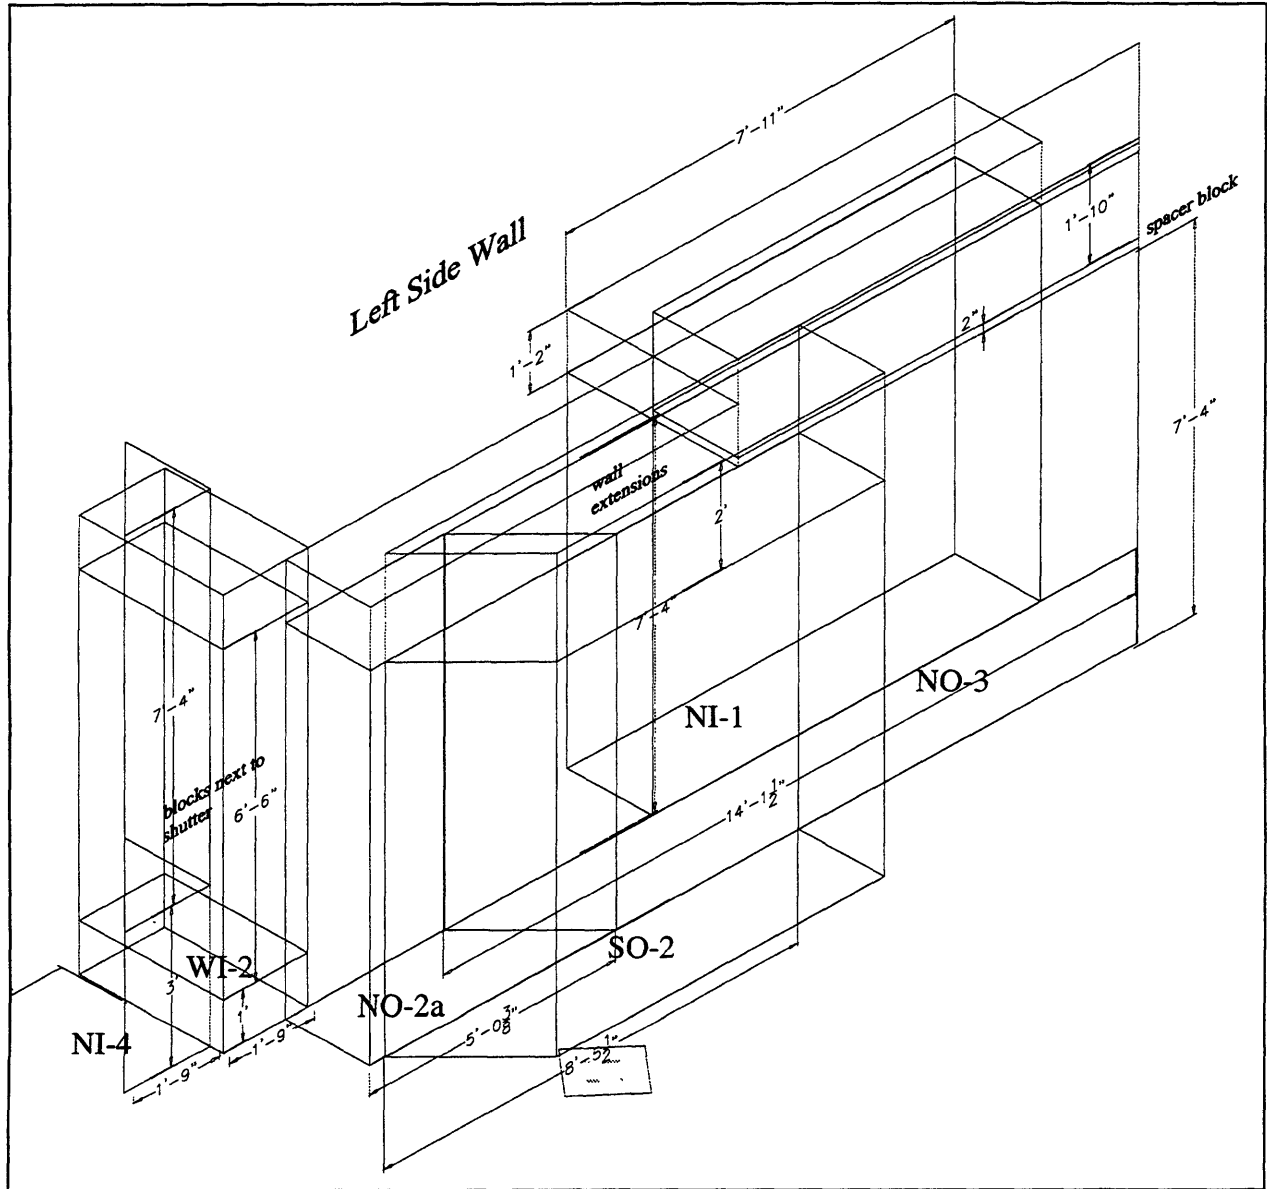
Left side wall showing spacer blocks and streaming prevention blocks. Drawing also shows one possible location for ventilation exit duct.
